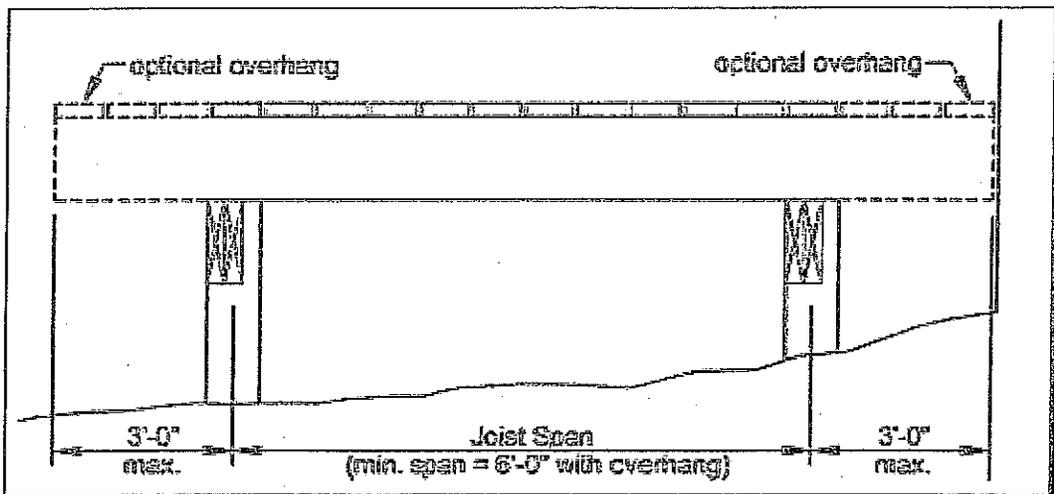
JOIST SPAN - FREE-STANDING DECK
